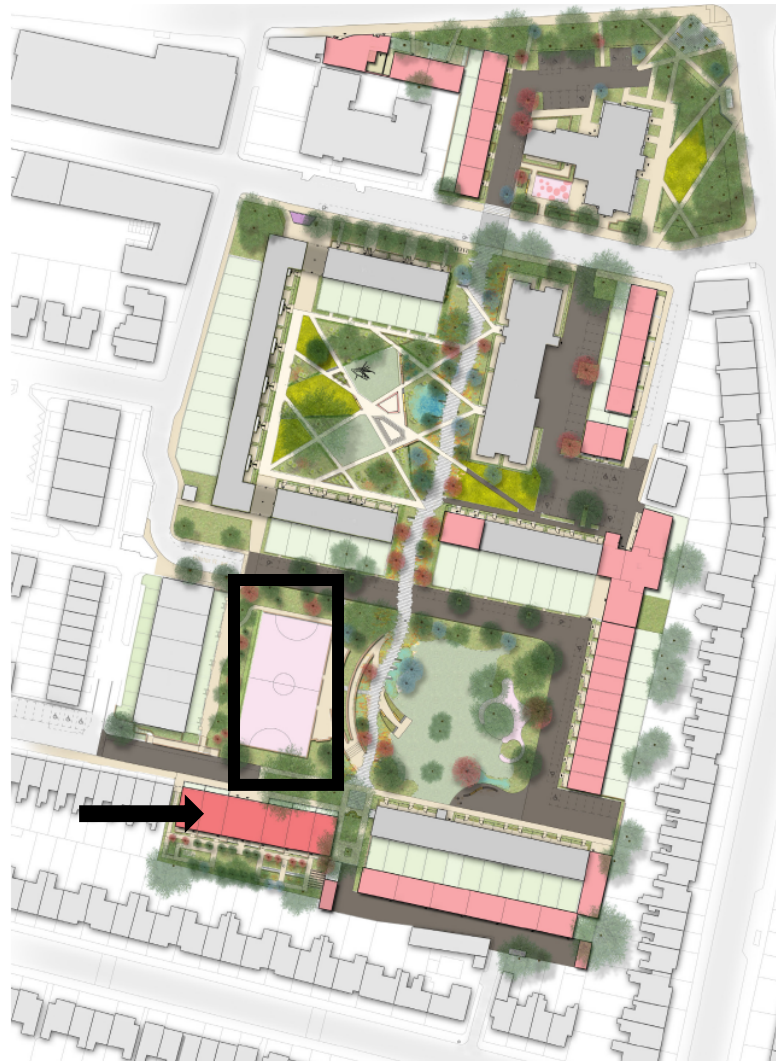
Arrow shows new Block H (23 x 1 bed units for over 55s) where Mitchison Road ballcourt was initially located prior to being relocated south (new location shown in rectangle)
